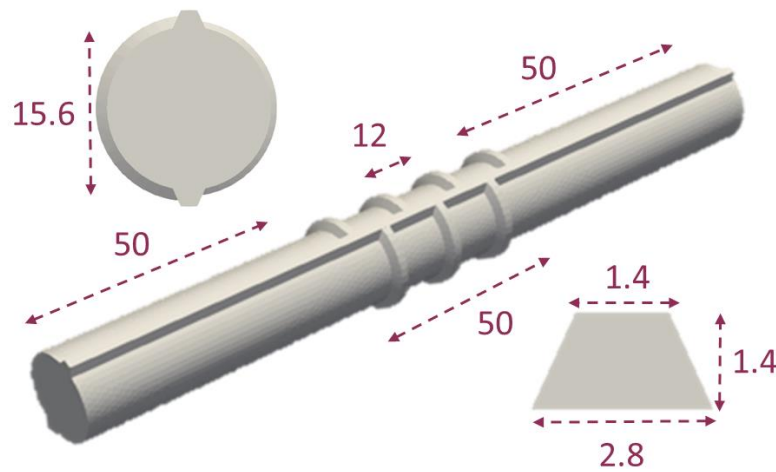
Dimensions of the modelled herringbone steel bar (in mm)
